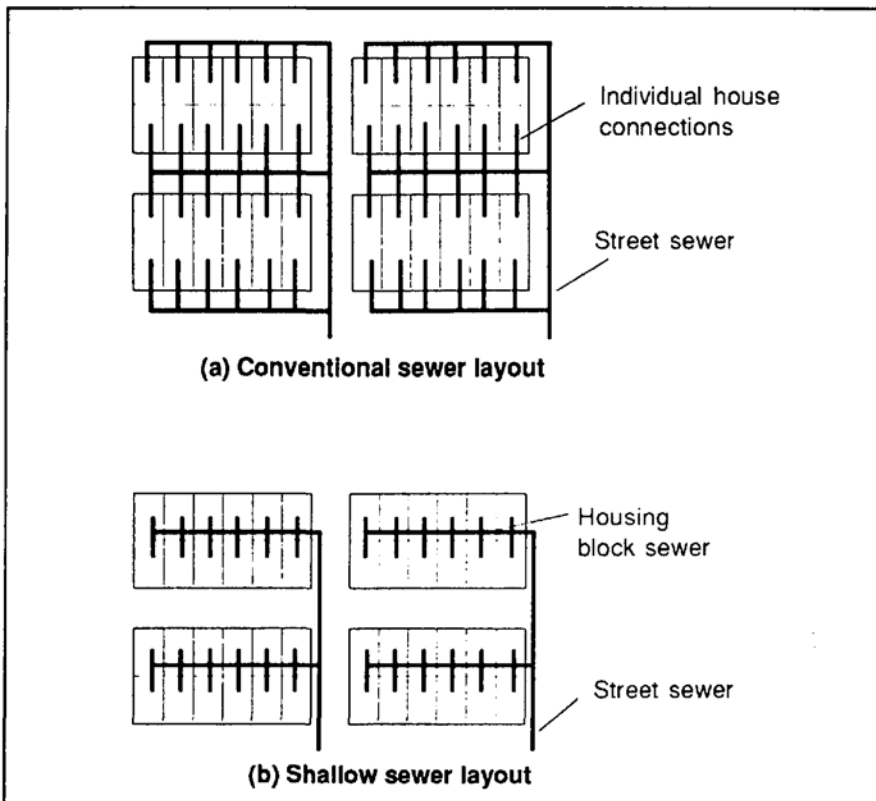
Schematic layout of conventional and shallow sewer-systems (adapted from UNCHS, 1986).
